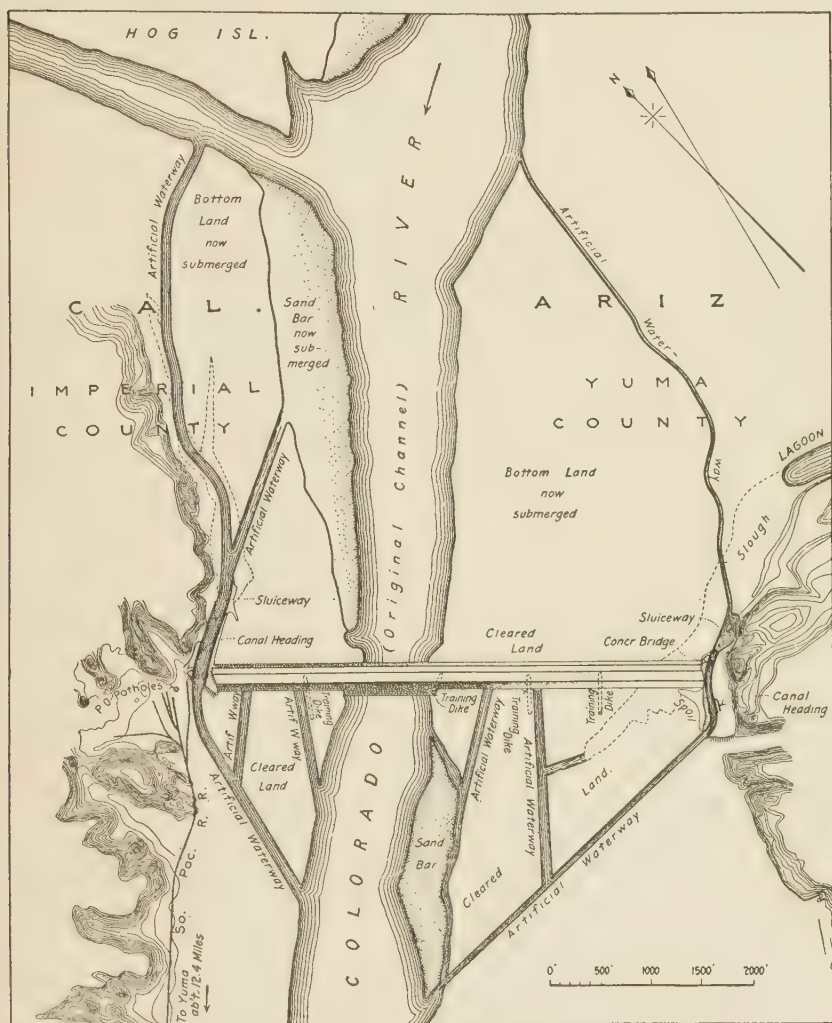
General plan of Laguna dam, sluiceways and canal headings.
